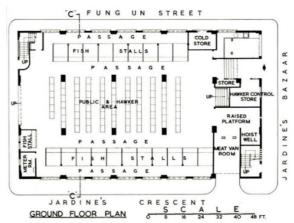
Tang Lung Chau Market floor plan at 1963 (Docomomo Hong Kong, 2019)
